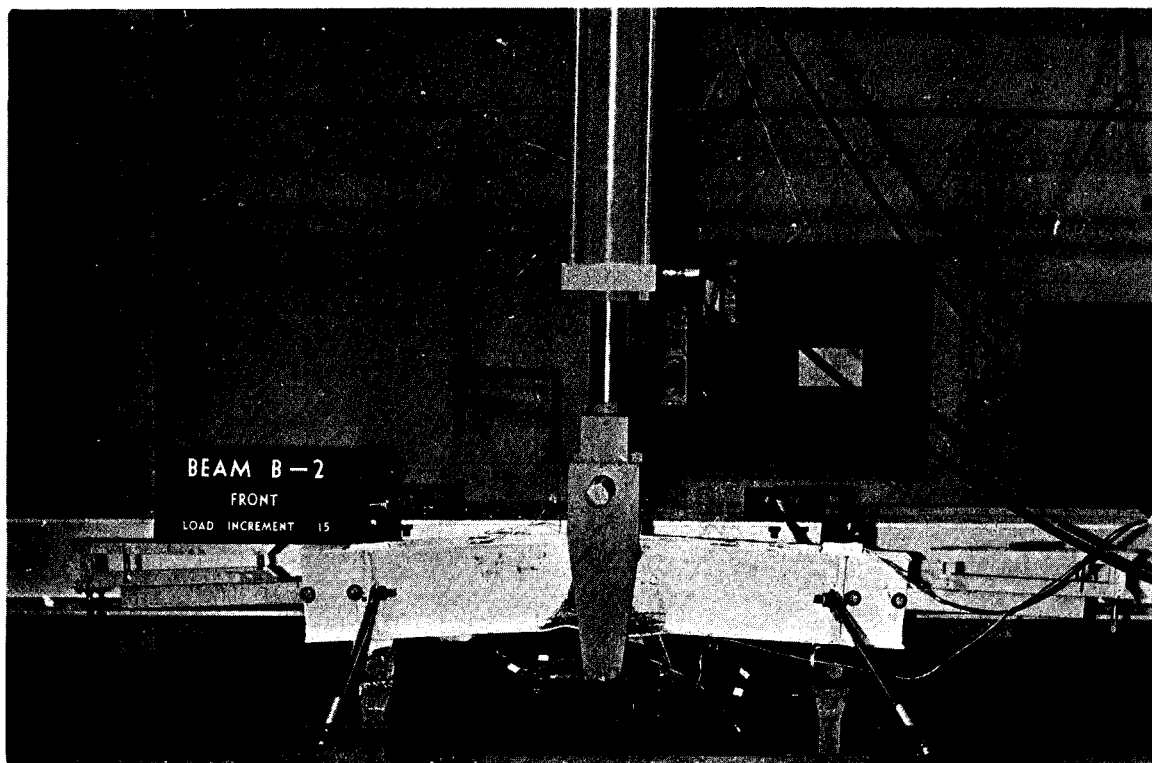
TEST SETUP - TOP FRONT VIEW
